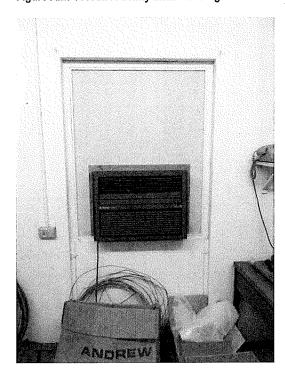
ACMA Facility Main Building interior covered window/door and air-conditioner.
